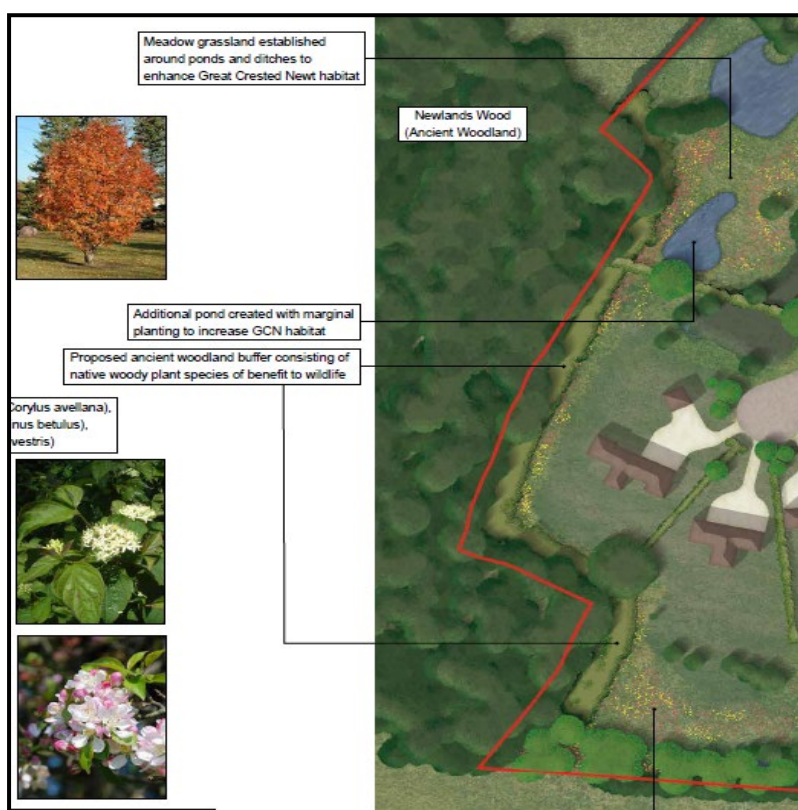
Extract from Landscape Plan showing buffer zone with ancient woodland
